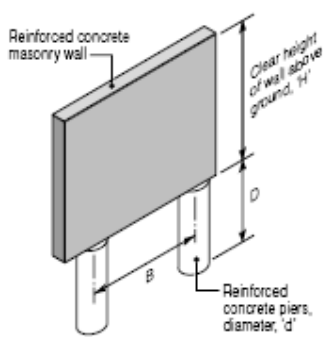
Reinforced Concrete Masonry Wall with Reinforced Concrete Piers
